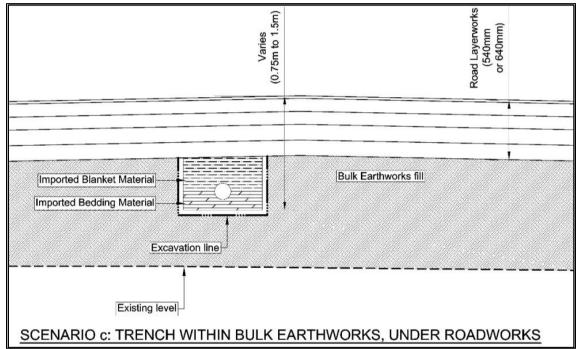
SCENARIO C: SERVICES- TRENCH WITHIN Bulk Earthworks (under roadworks) (SOURCE: WALTERS, 2020)
